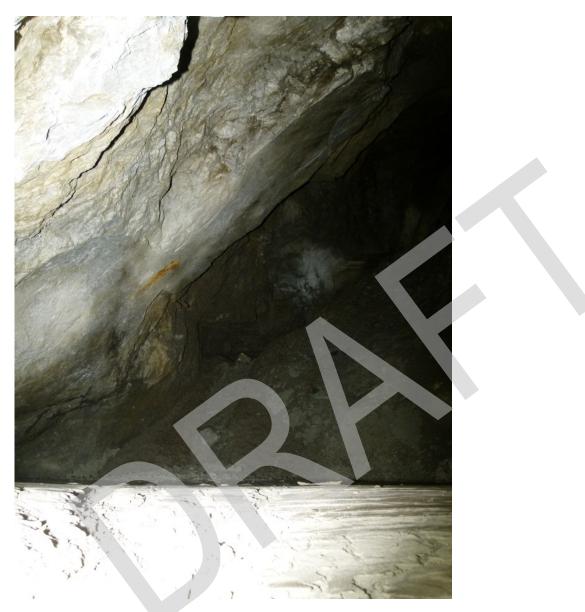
Constructed fill fence (barricade 1) showing paste spillage from ports
